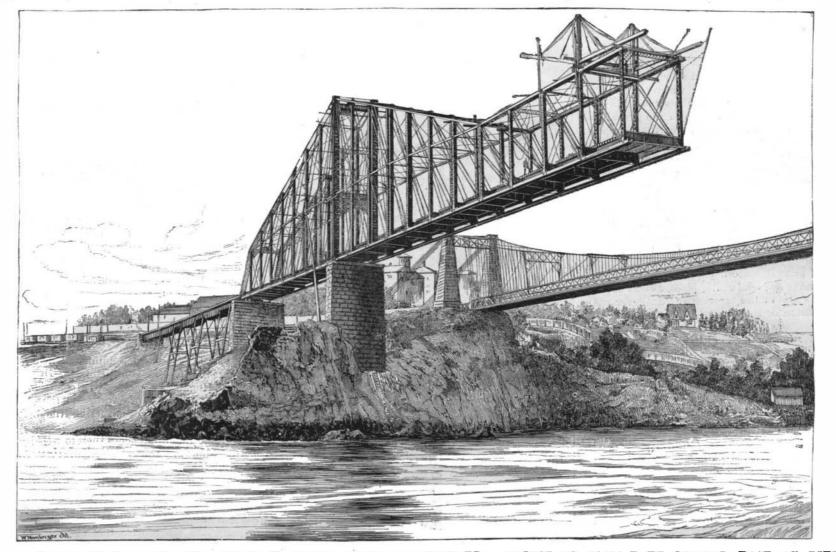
WEST SHORE ARM AND HALF OF RIVER SPAN, AS ERECTED, PROJECTING 262% FEET BEYOND FACE OF PIER.
